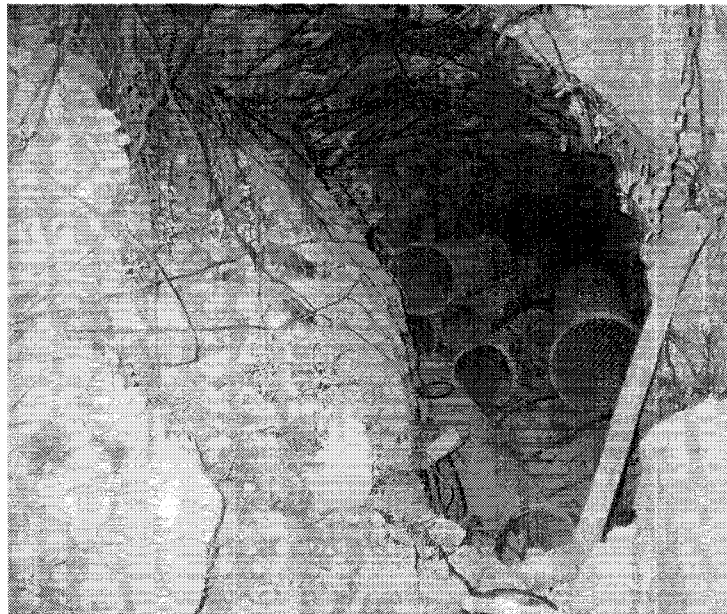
View north-west along 24-27 cross-cut showing large deformation of the south-west sidewall of the tunnel.
